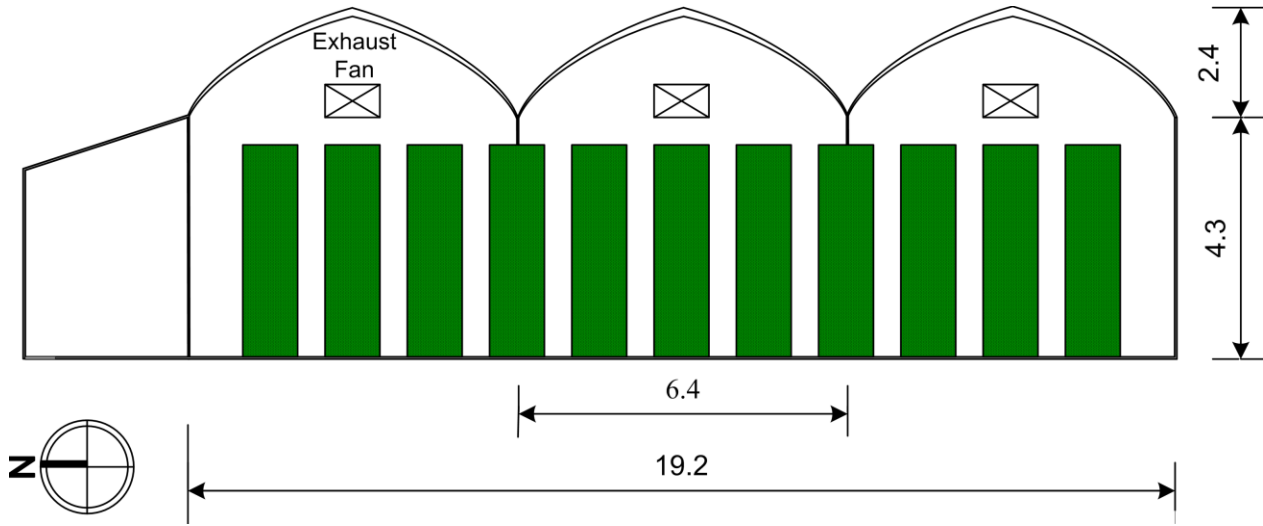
Sketch of the greenhouse cross section (unit: m).
